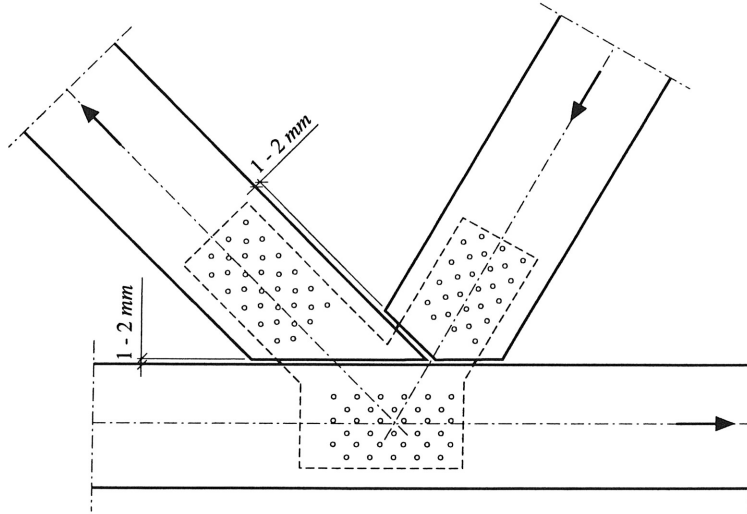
Truss joint assembled with a Multiple Nail Connector.
